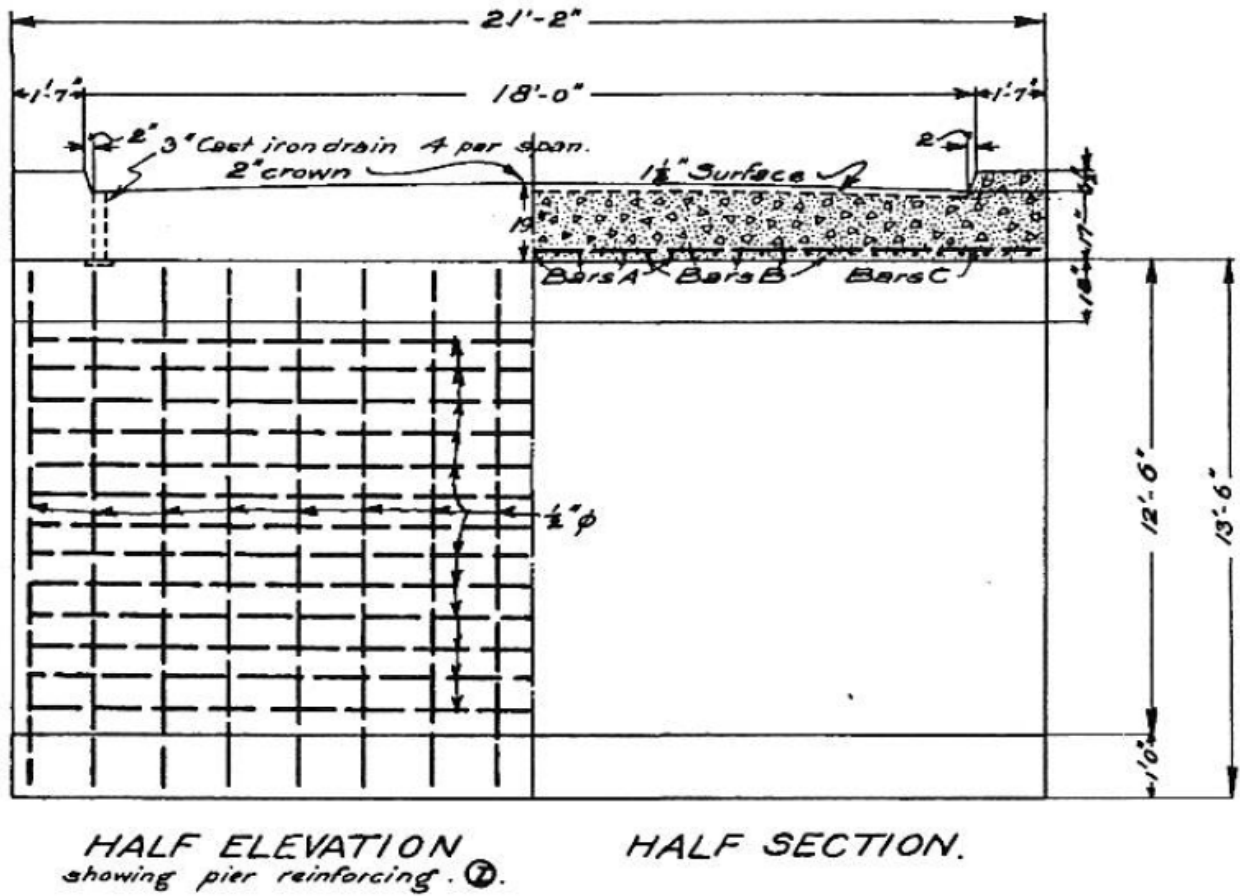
1924 Drawings of Roadway Section of Two-Span Continuous Bridge in Fayette Co. from SHDA (1924)
